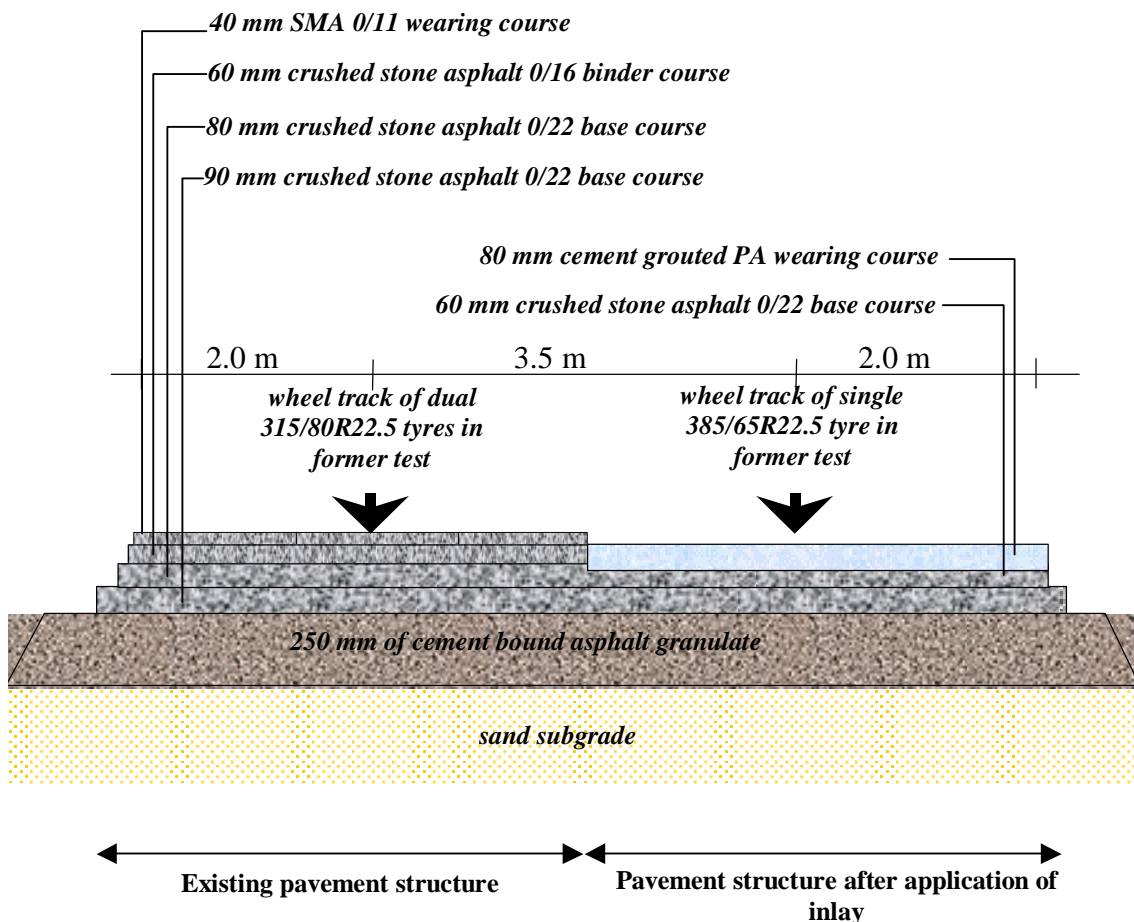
Cross section of test pavement pavement after applying cement grouted porous asphalt wearing course
